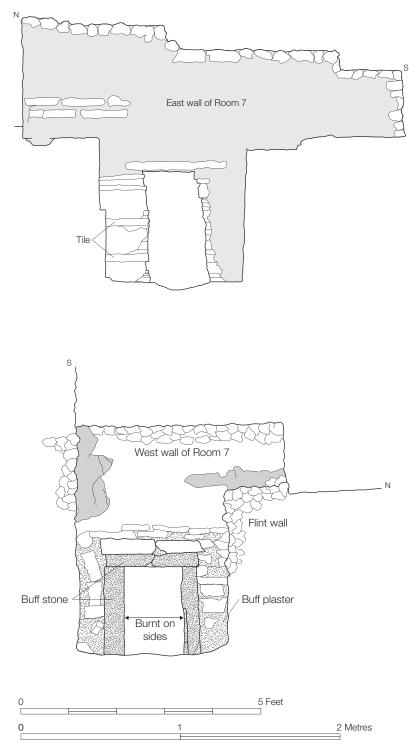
Building 182, South Range: Room 7, elevations of stokeholes
